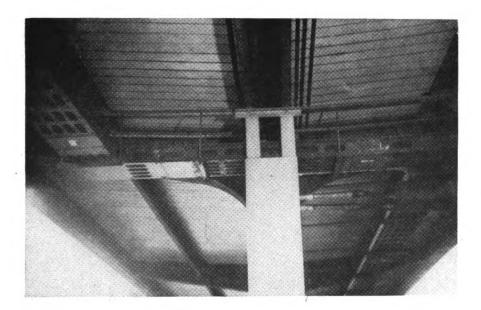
Vertical ducts from the switchboard cubicle are carried inside a steel housing to the shed roof where they branch to run north and south respectively
